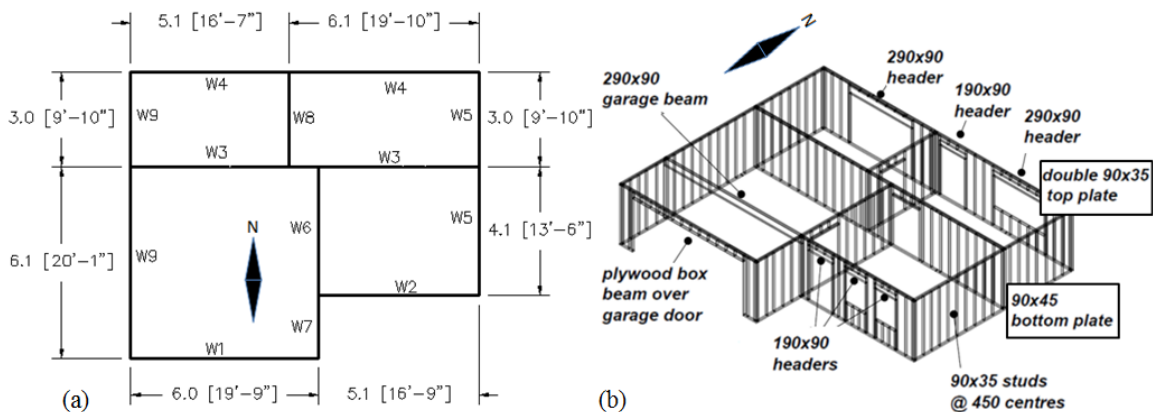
(a) Floor Plan with Centerline Dimensions [m (ft-in)] and Wall Designation, (b) Wall framing (mm) (Paevere 2002)
